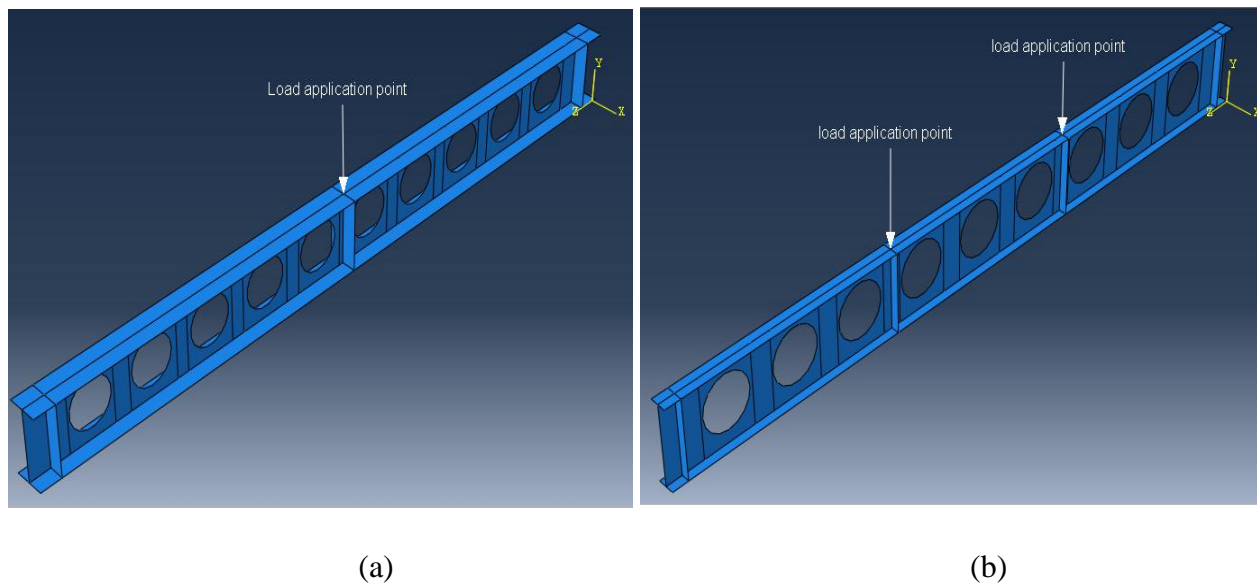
Loading position for (a) beam 1A and (b) beam 3B [5]
